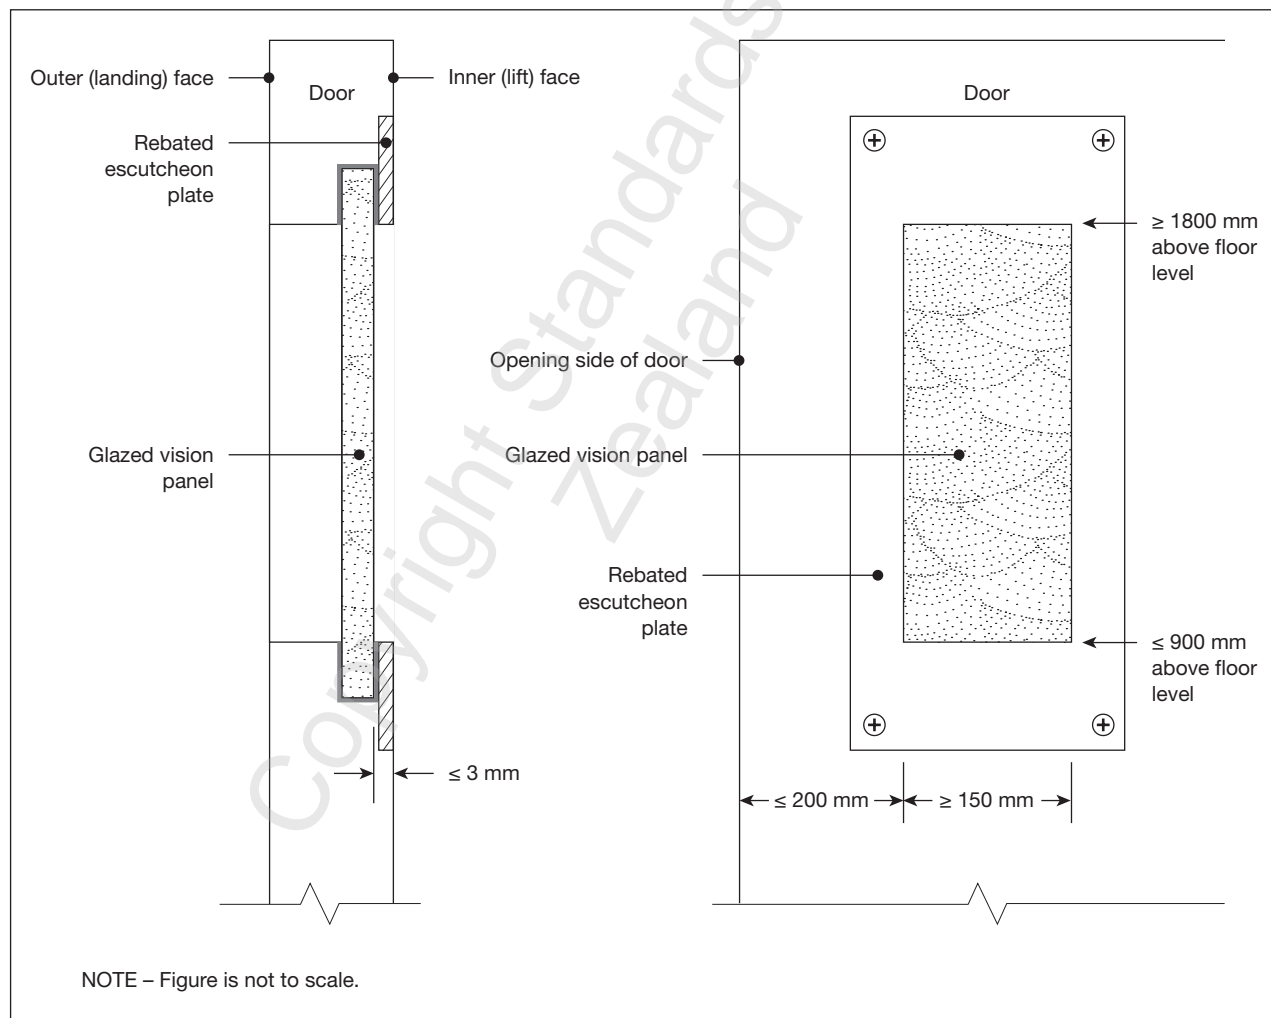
Preferred arrangement for glazed vision panel, with glazing secured by rebated escutcheon plate
